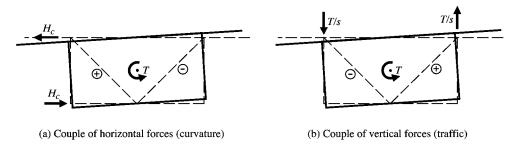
Cross section deformation and sign convention for the forces in the diagonals of the truss cross bracing.
